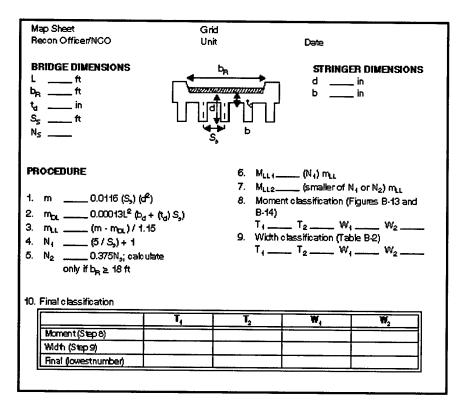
Concrete T-beam Bridge With asphalt Wearing Surface
